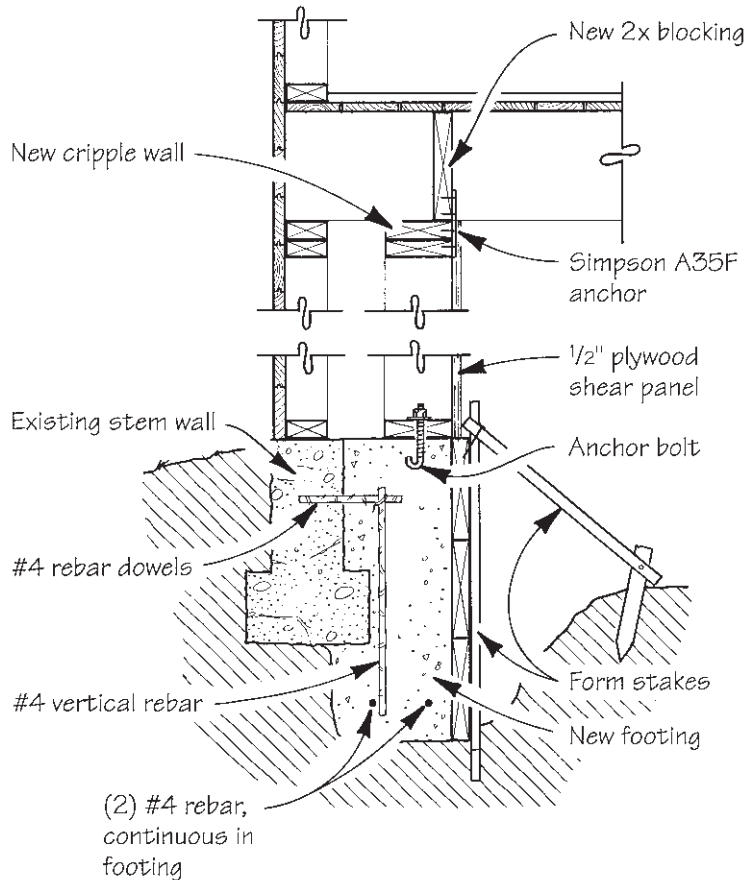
In cases where the old foundation is too weak to hold anchors, it's necessary to pour a new wall. In the case shown here, a new stepped stem wall was poured tight to the existing one, with new cripple walls built on top. Simpson A35F clips secure the cripple wall to solid blocking between the floor joists above (see photo).
